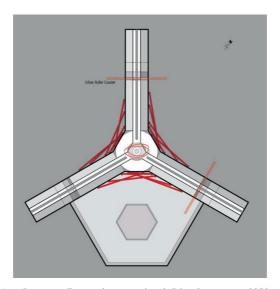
Jae Ho Lee, Ryugyong Tower, plan, tunnel and slides, Pyongyang, 2050.
